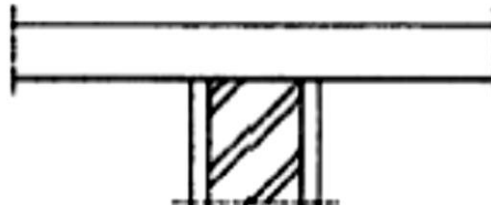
Slab Resting on The Wall (Sudarno, 2022)
